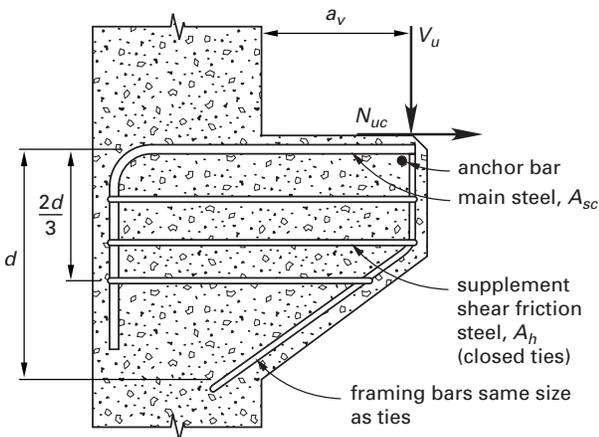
Elevation of Bracket or Corbel Supported by Column (column steel omitted for clarity)
